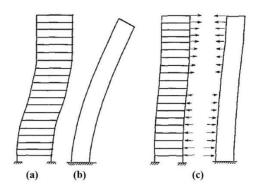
Typical Deformation Modes [4] (a) Free Frame (b) Free wall (c) Combined Frame and Wall
